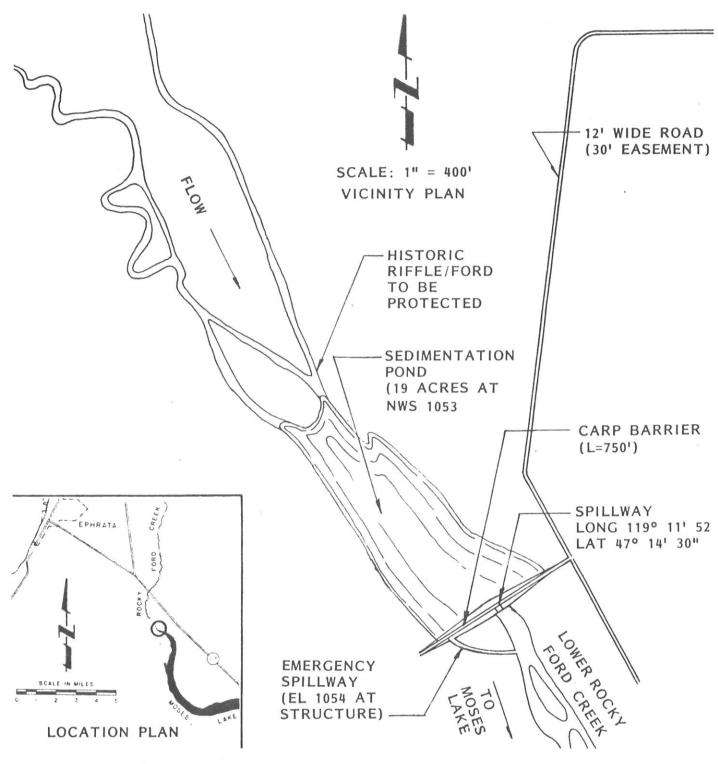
Rocky Ford Creek Detention Pond Plan
